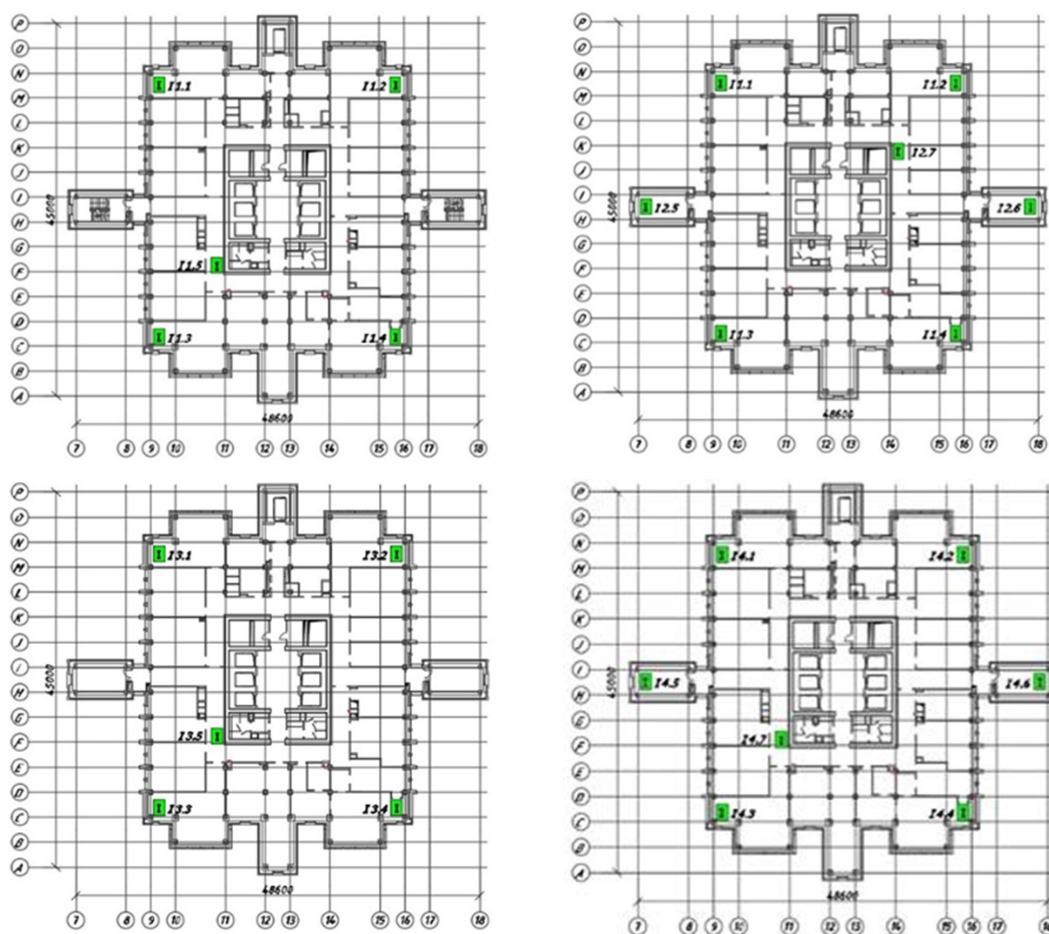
Location of inclinometers for frame-bond frame with monolithic reinforced concrete core on 7, 13, 20, 26 floors
